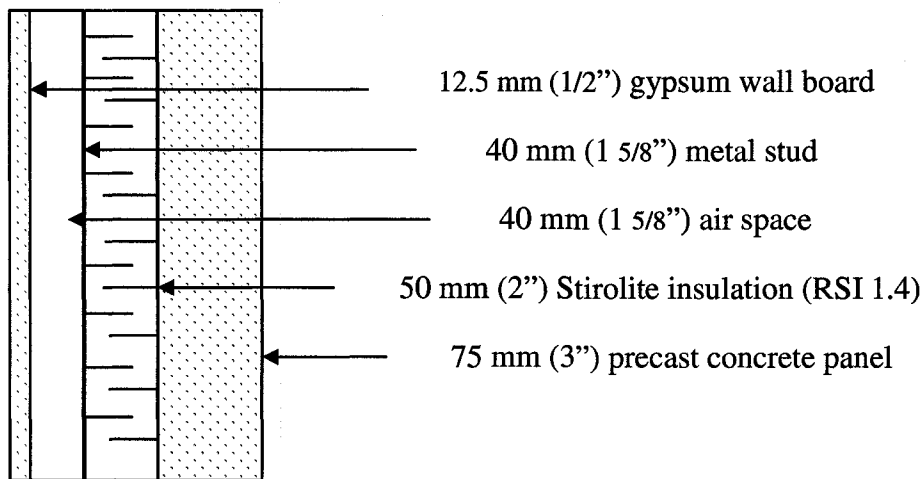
CROSS SECTION – TYPICAL EXTERIOR WALL
